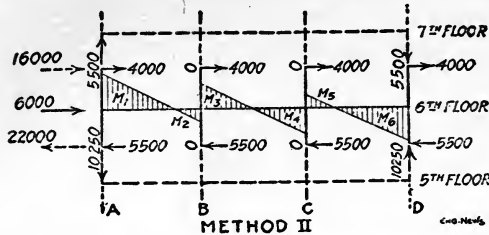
COLUMN-SHEARS AND GIRDER MOMENTS AT SIXTH FLOOR, CALCULATED BY METHOD II
